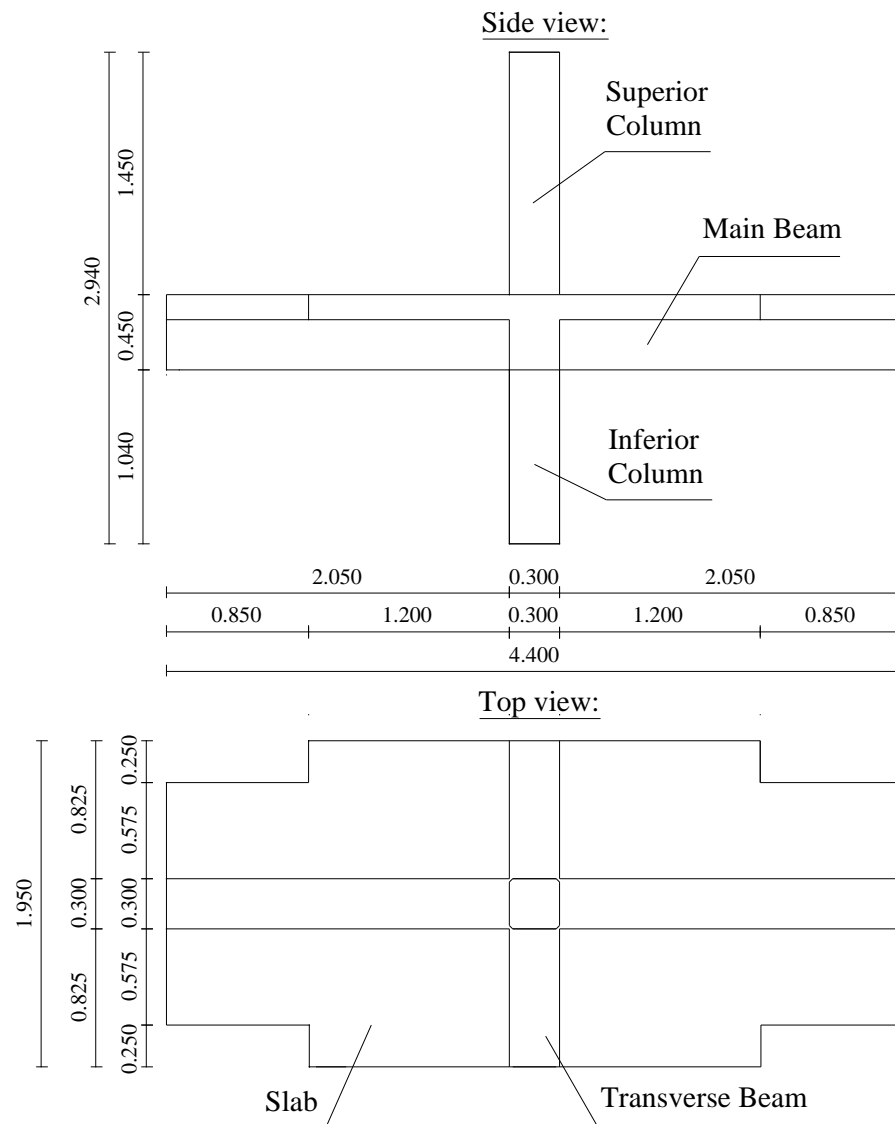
Beam-column joint specimens with slab and transverse beams (dimensions in m).
